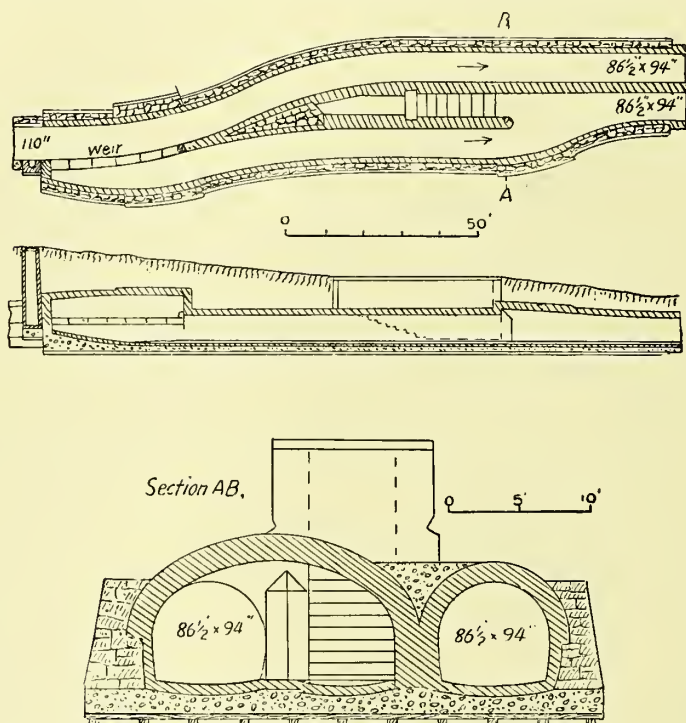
SECTIONS OF OUTLET SEWER, PROVIDENCE, RHODE ISLAND.
